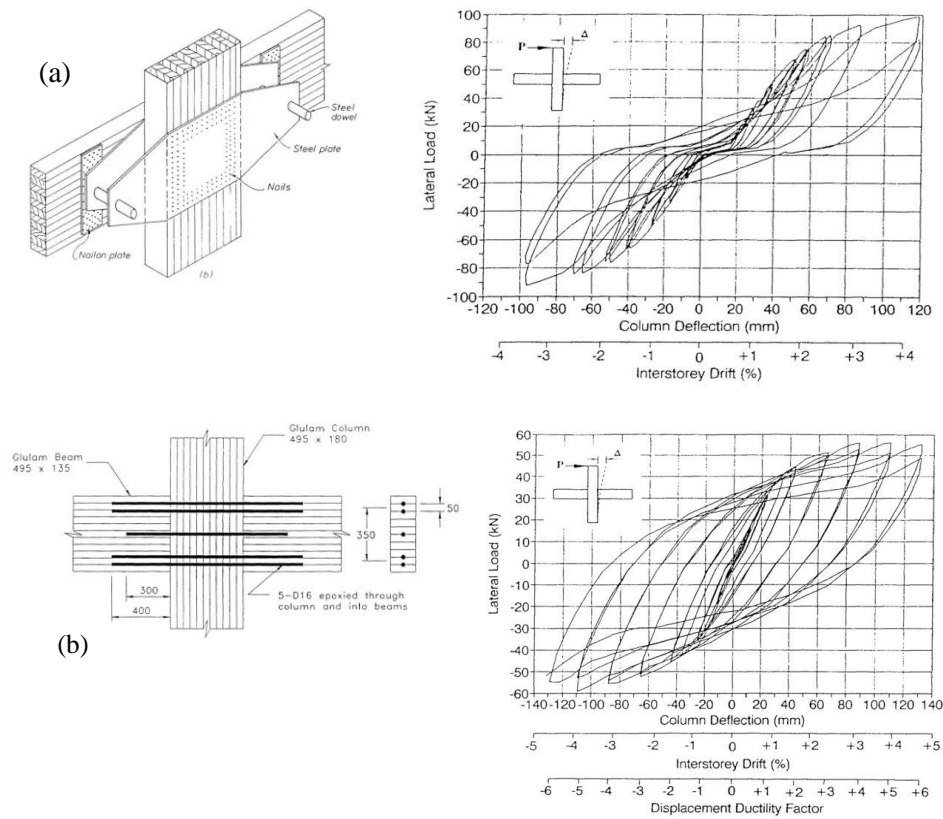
(a) Nailed and (b) epoxied steel rods connection for glulam beam-column joint
